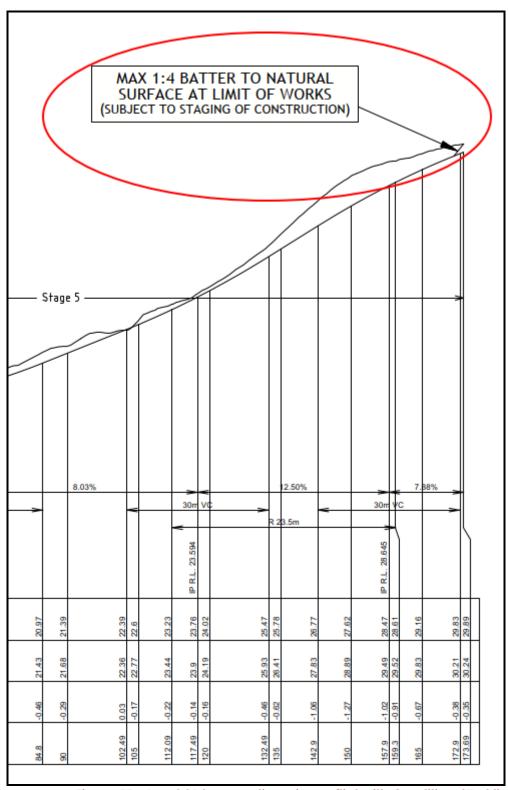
F – Road 21 long section – in conflict with Condition 47 at limit of works.
